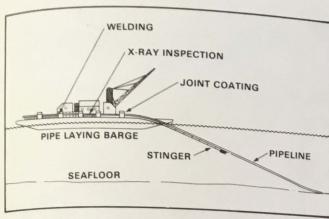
A pipe-laying barge of the type that could be used for laying subsea pipelines in the Beaufort Sea is shown here. The barge has a helipad for transfer of personnel and a large crane for handling the pipe sections which are joined on the deck then fed onto the sea floor.
